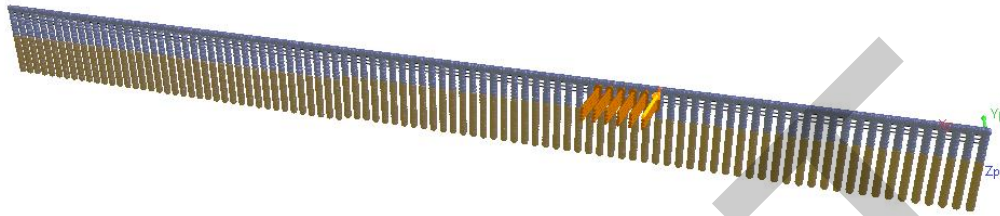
Layout – Load Case 2 (Section 2 – Soil C3)
